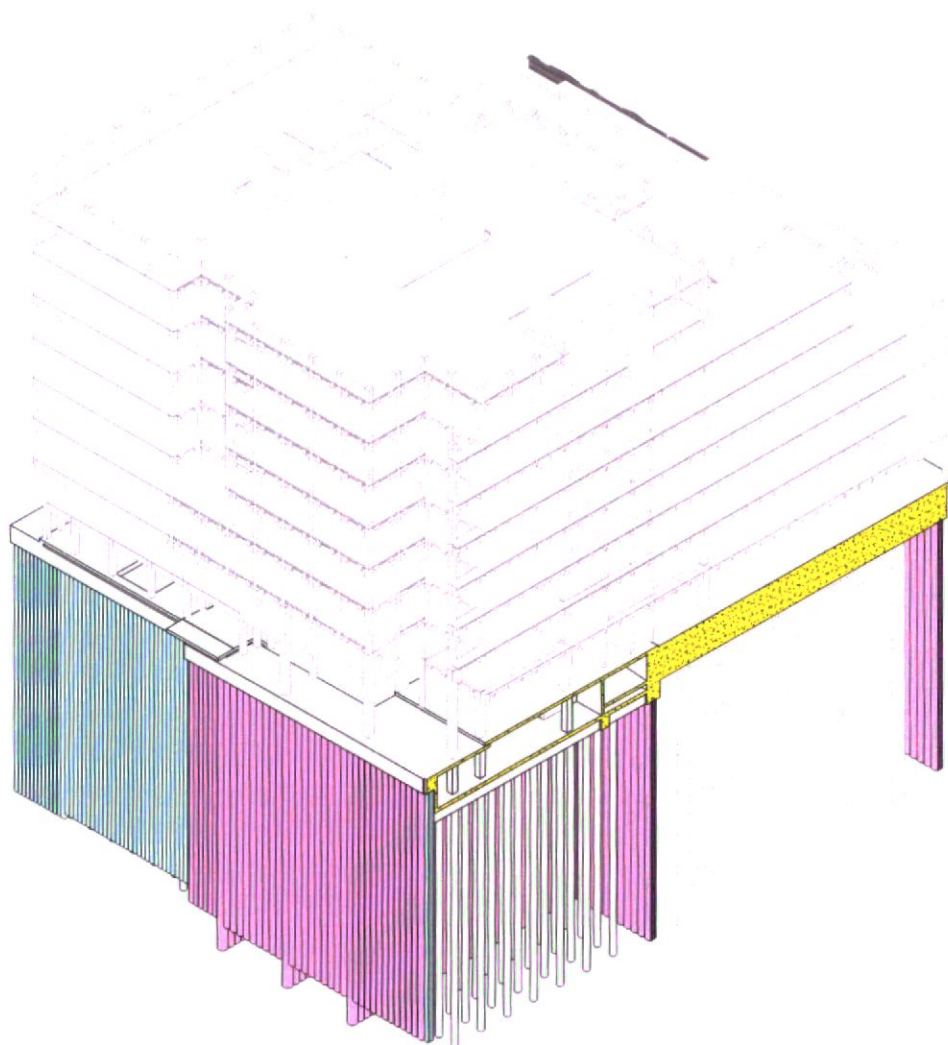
Proposed Site 2 Substructure Short Section (Through Block 2C)
